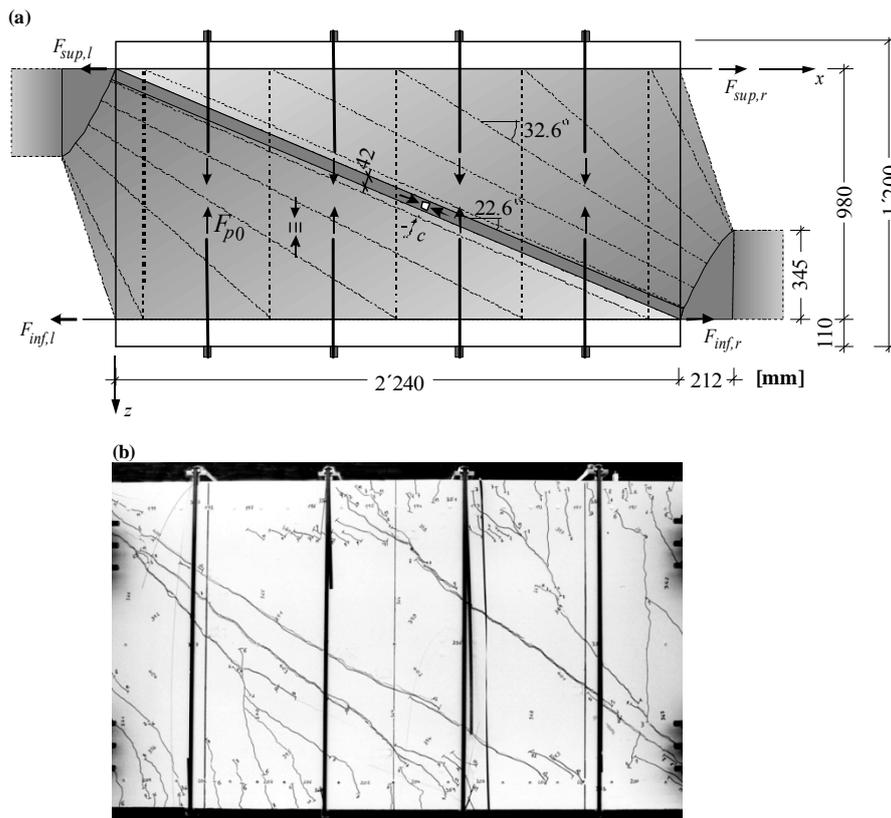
Shear wall ST1 loaded up to -635 kN: (a) on top: discontinuous stress field; (b) on bottom: crack distribution.
